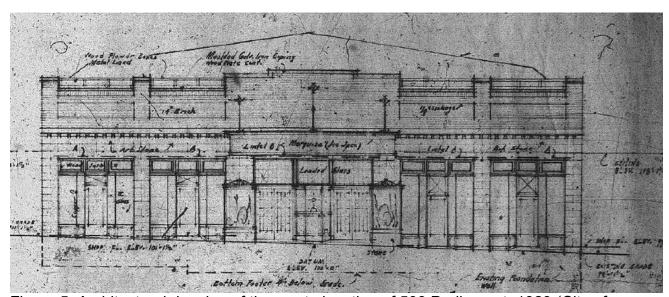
Architectural drawing of the west elevation of 509 Parliament, 1929 (City of Toronto Building Records, Permit No. B10104).
